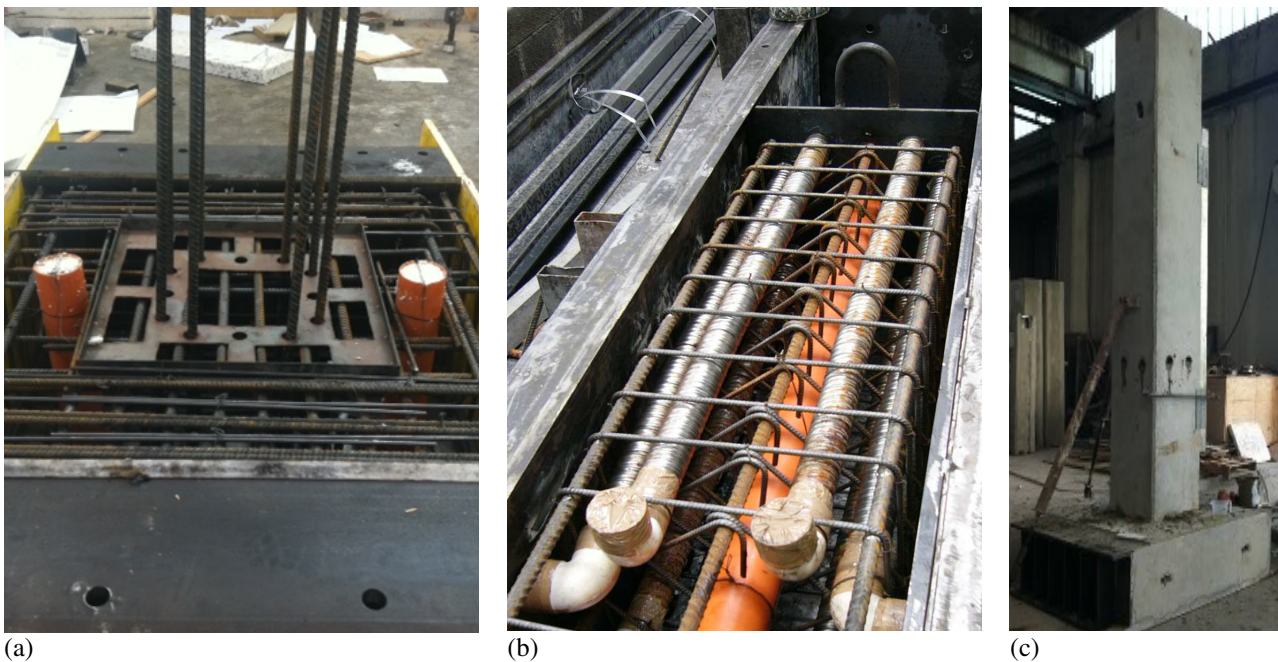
Reinforcement cages of (a) foundation, with the eight projecting bars, and (b) column, with the corresponding corrugated steel sleeves; (c) assembled specimen with the sleeves just grouted
